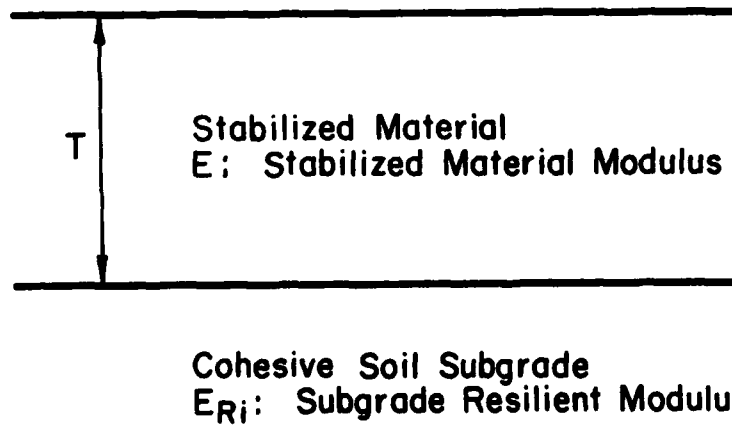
Typical ALRS Stabilized Base Section Pavement.
